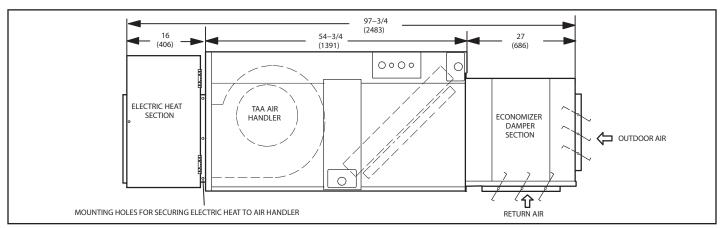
TAA Horizontal Application - Dimensions - inches (mm)
